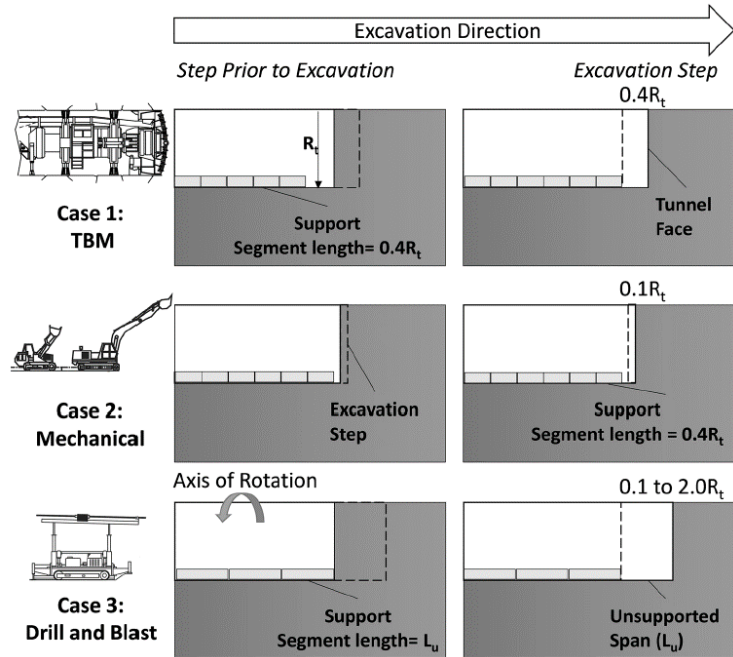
Representation of excavation sequences with supported and unsupported spans, using TBM, mechanical, and drill and blast excavation methods in axisymmetric numerical models (after Oke et al., 2018)
